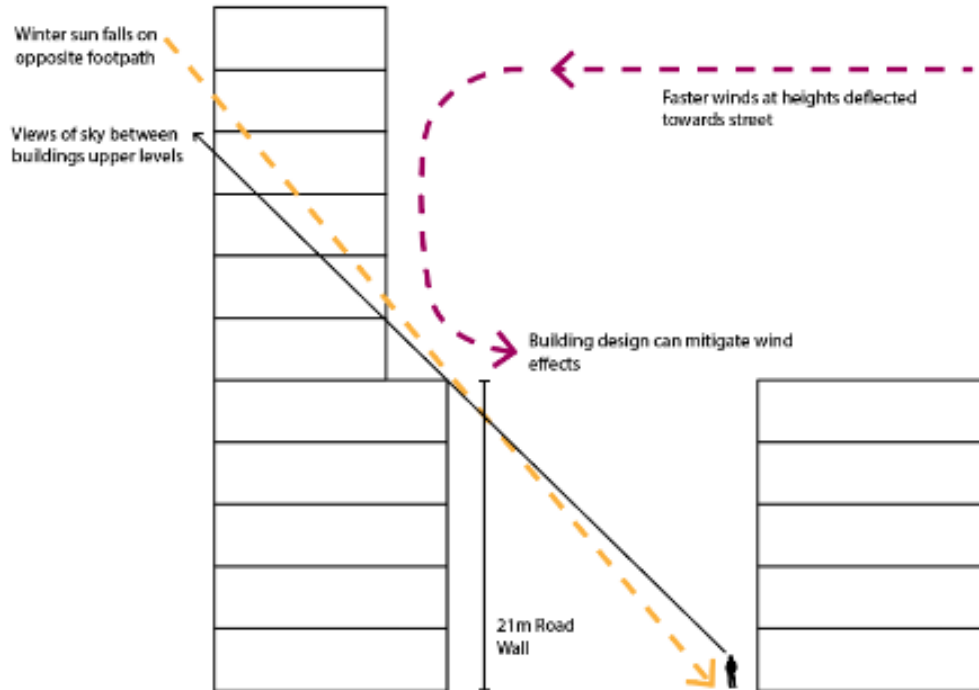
Some benefits of a road wall height - Solar access can be assisted through road wall heights and gaps in the buildings, whilst downdrafts are deflected away from ground level.
